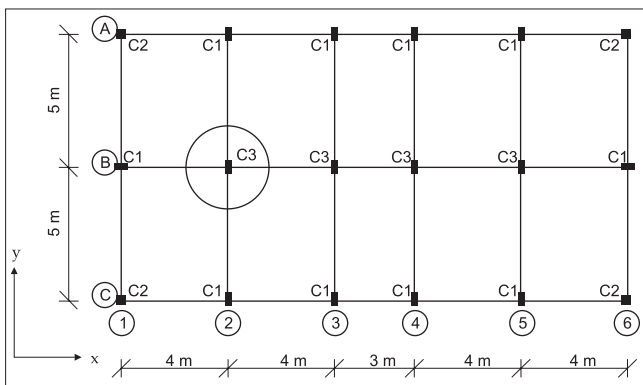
Plan of a ground plus four storey reinforced concrete office building
